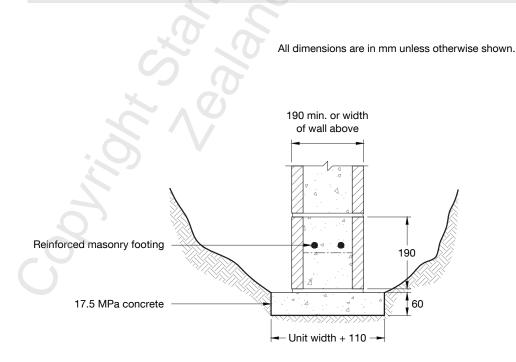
Reinforced masonry footing (see 6.4.1)
